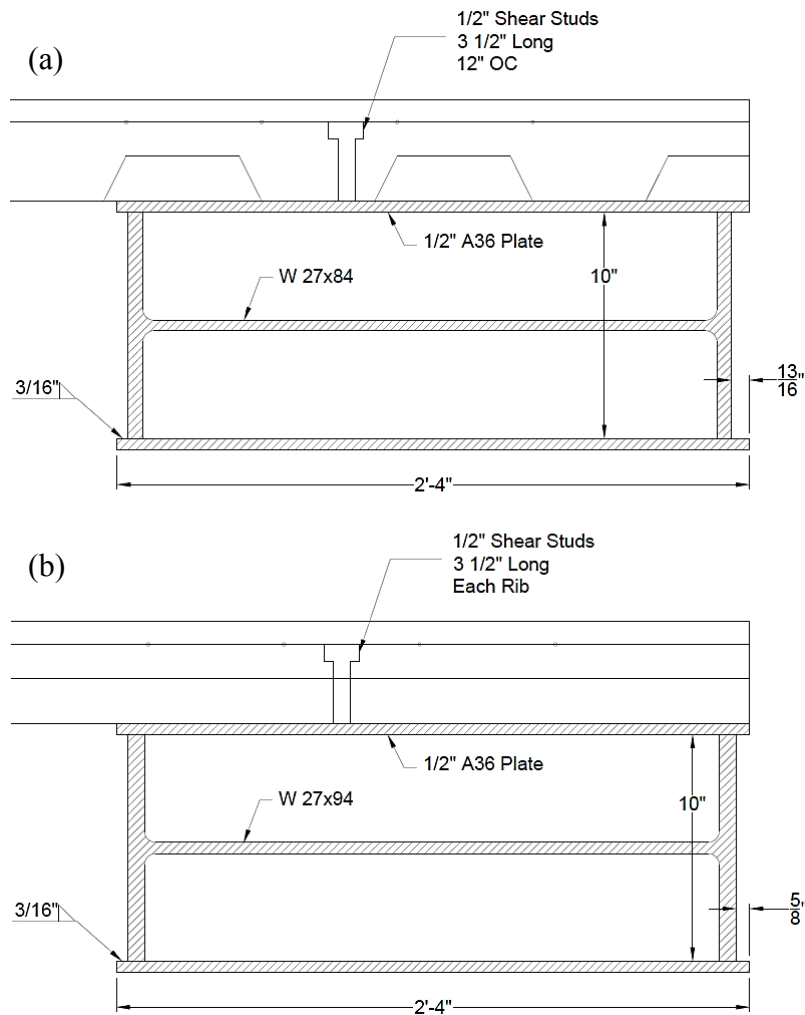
Ring beam details: (a) east-west ring beam; (b) north-south ring beam. (From Hull (2013))
